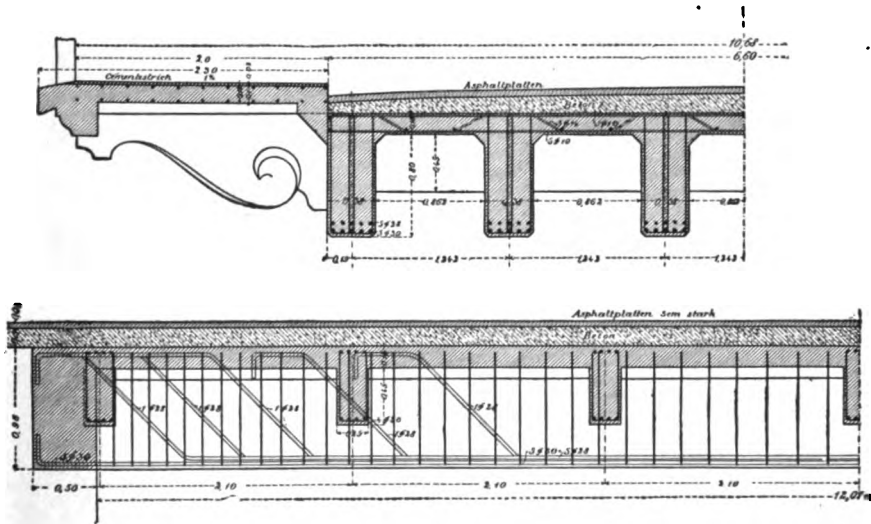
Hornback Bridge near Zweibrücken. Cross and longitudinal sections.
